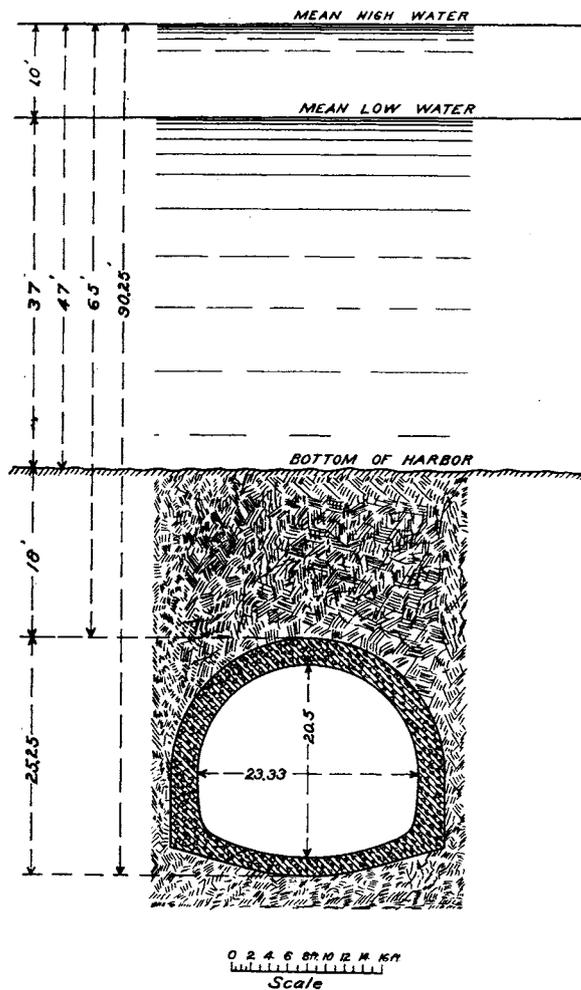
UNDERGROUND RAILWAY, BOSTON, U.S.A.
